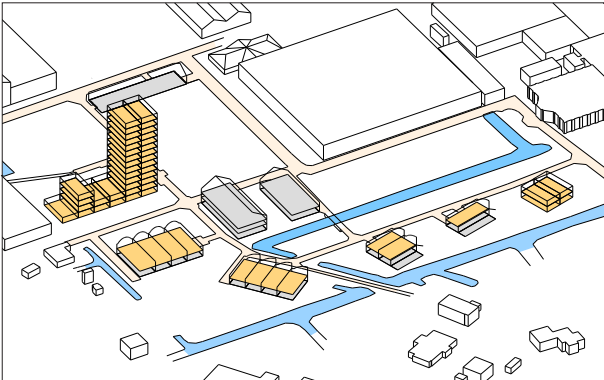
% (pushing the added floor space into the air, leaving open space untouched as much as possible)
